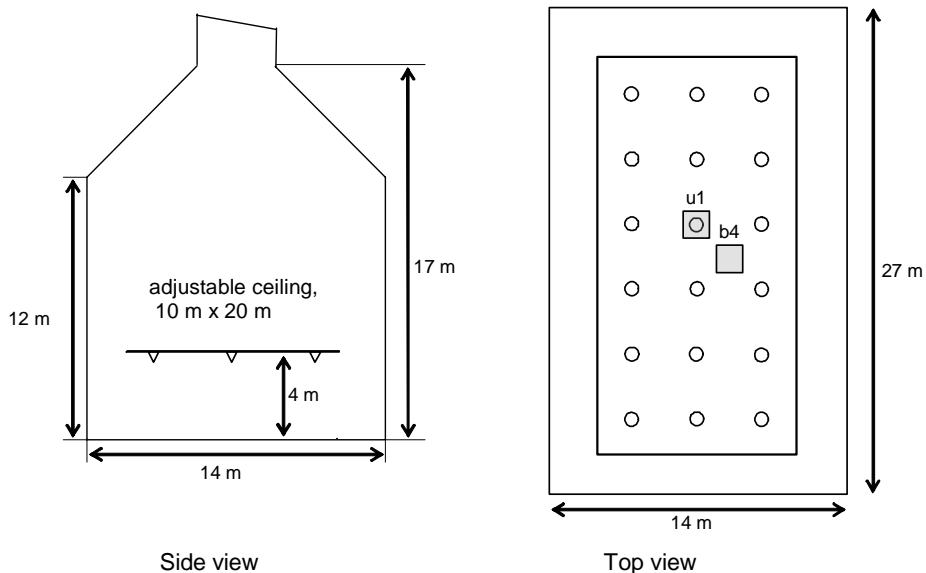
Schematic presentation of the experimental arrangement in the test hall, indicating the positions for the 18 heads of the standard spray sprinkler system, and the fire locations under 1 sprinkler ('u1') and between 4 sprinklers ('b4').
